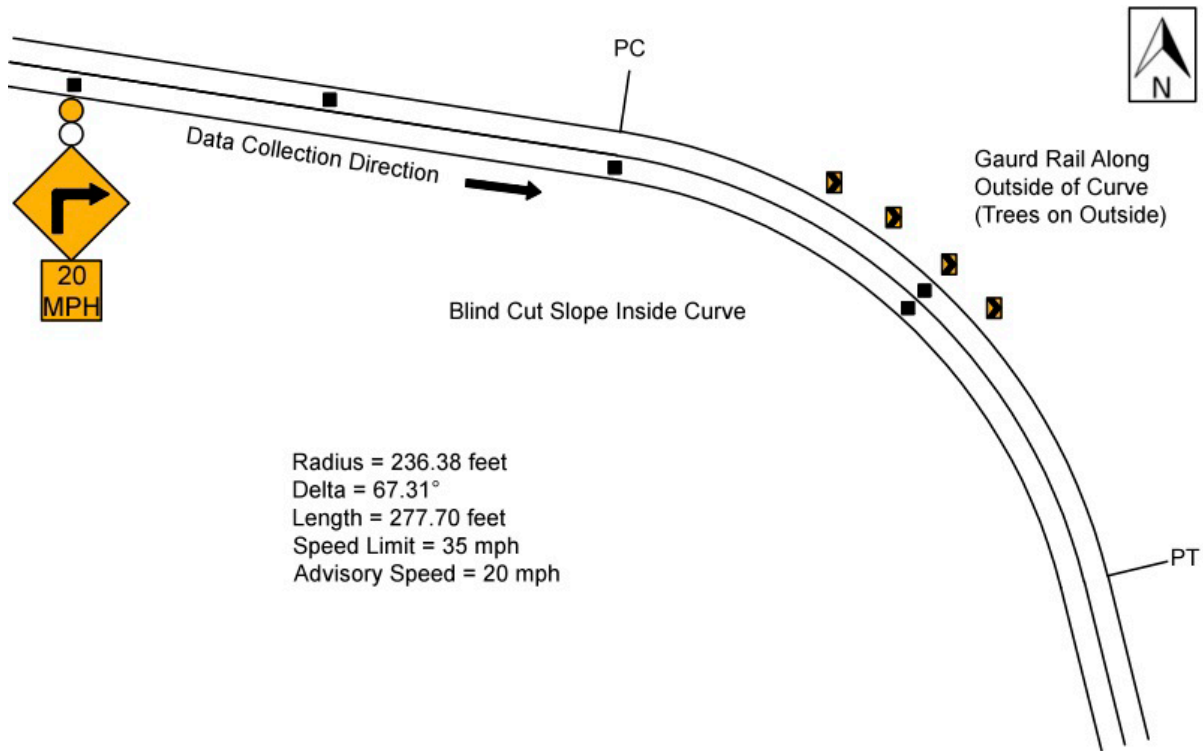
Diagram. Geometric layout of Alabama Location #4 (not to scale).
